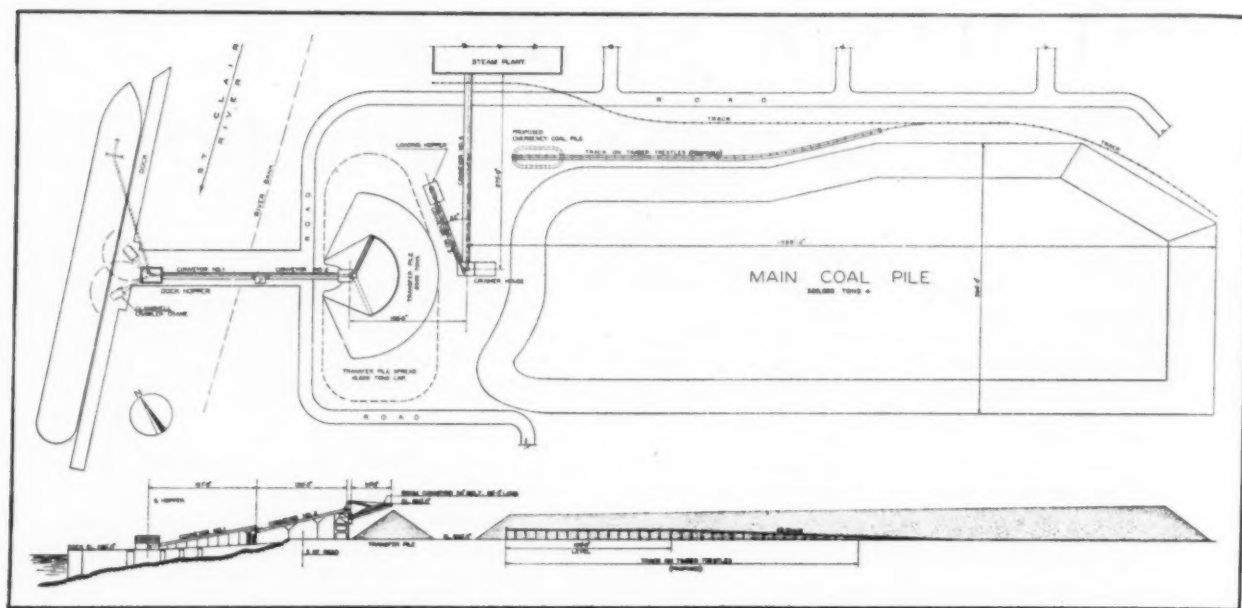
GENERAL PLAN AND SECTION THROUGH COAL-HANDLING INSTALLATION AND STORAGE PILE AT THE POLYMER PLANT
